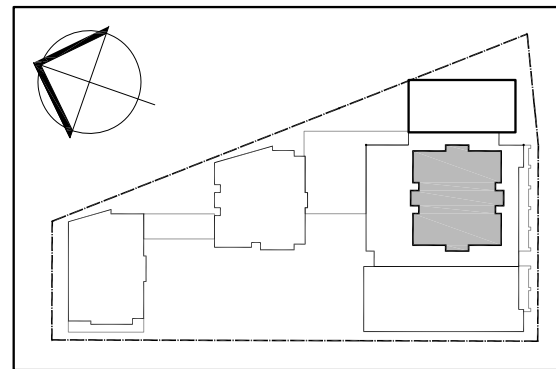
Upper Floor Plan A (Floors 35 to 37), Residential Tower 1
